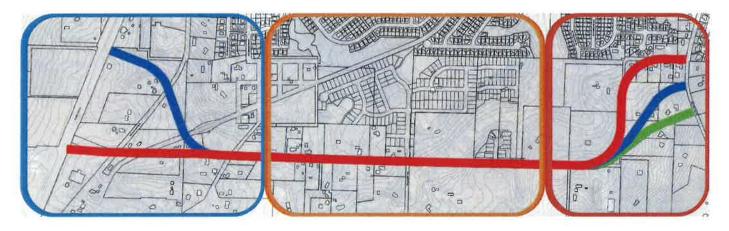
Brookman Concept Plan Subareas and Alignment Options Considered
